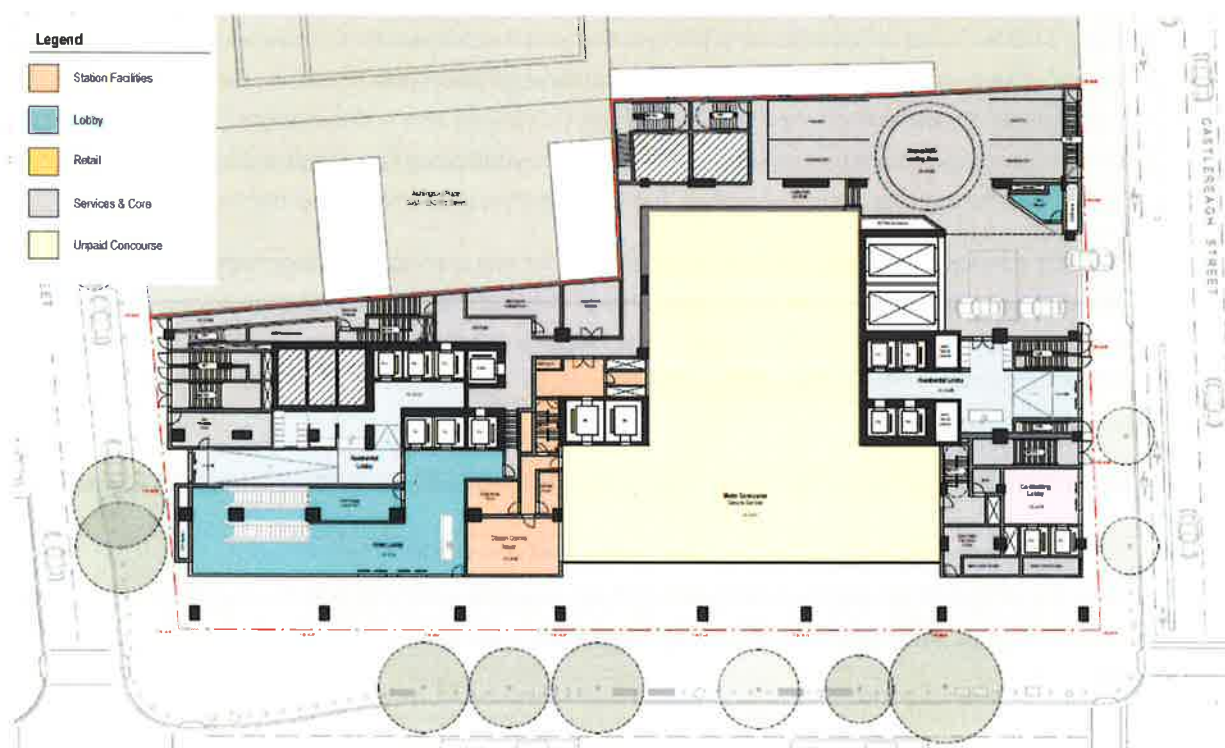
| Mixed-use scheme indicative ground floor plan (source:EIS)
